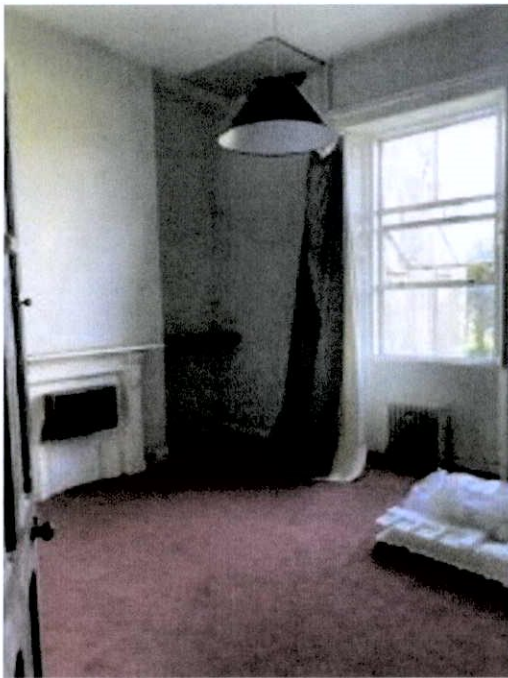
Typical entrance level accommodation with corbelled chimneypiece and original door and window boxes. Replacement window frames to northern elevation.
